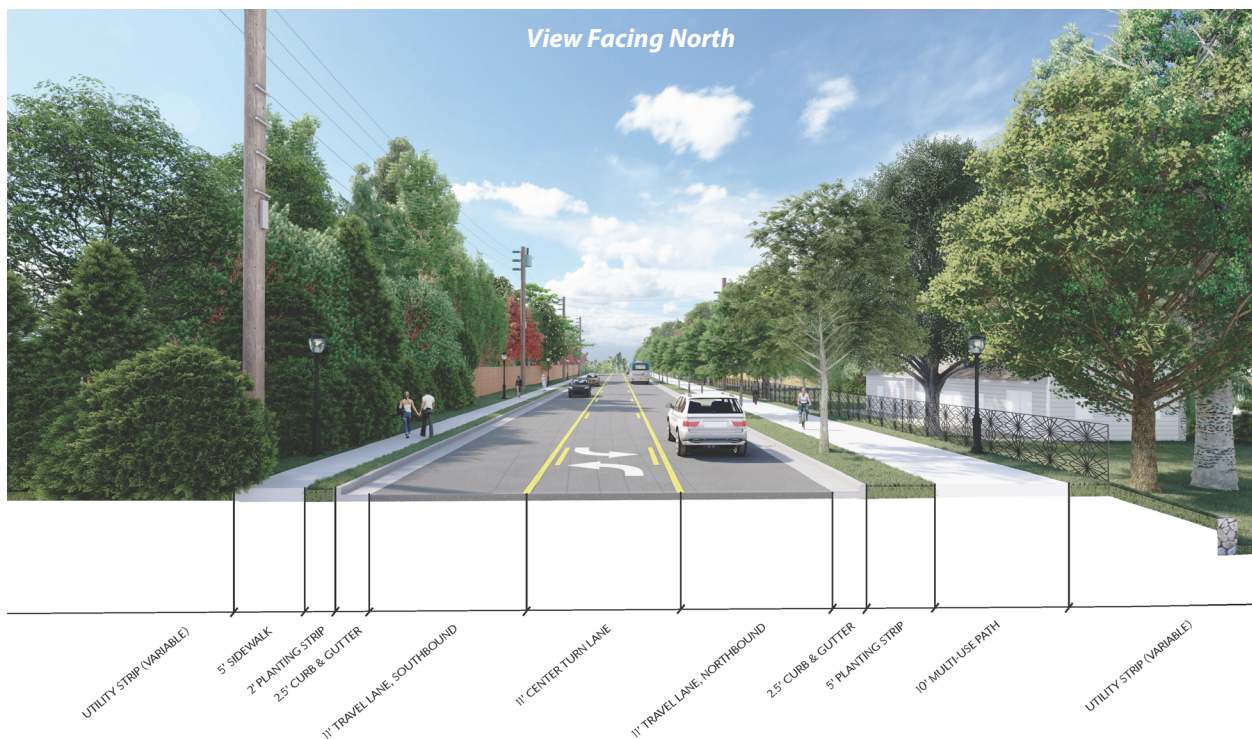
RECOMMENDED TYPICAL CROSS-SECTION FOR SEGMENT 3
